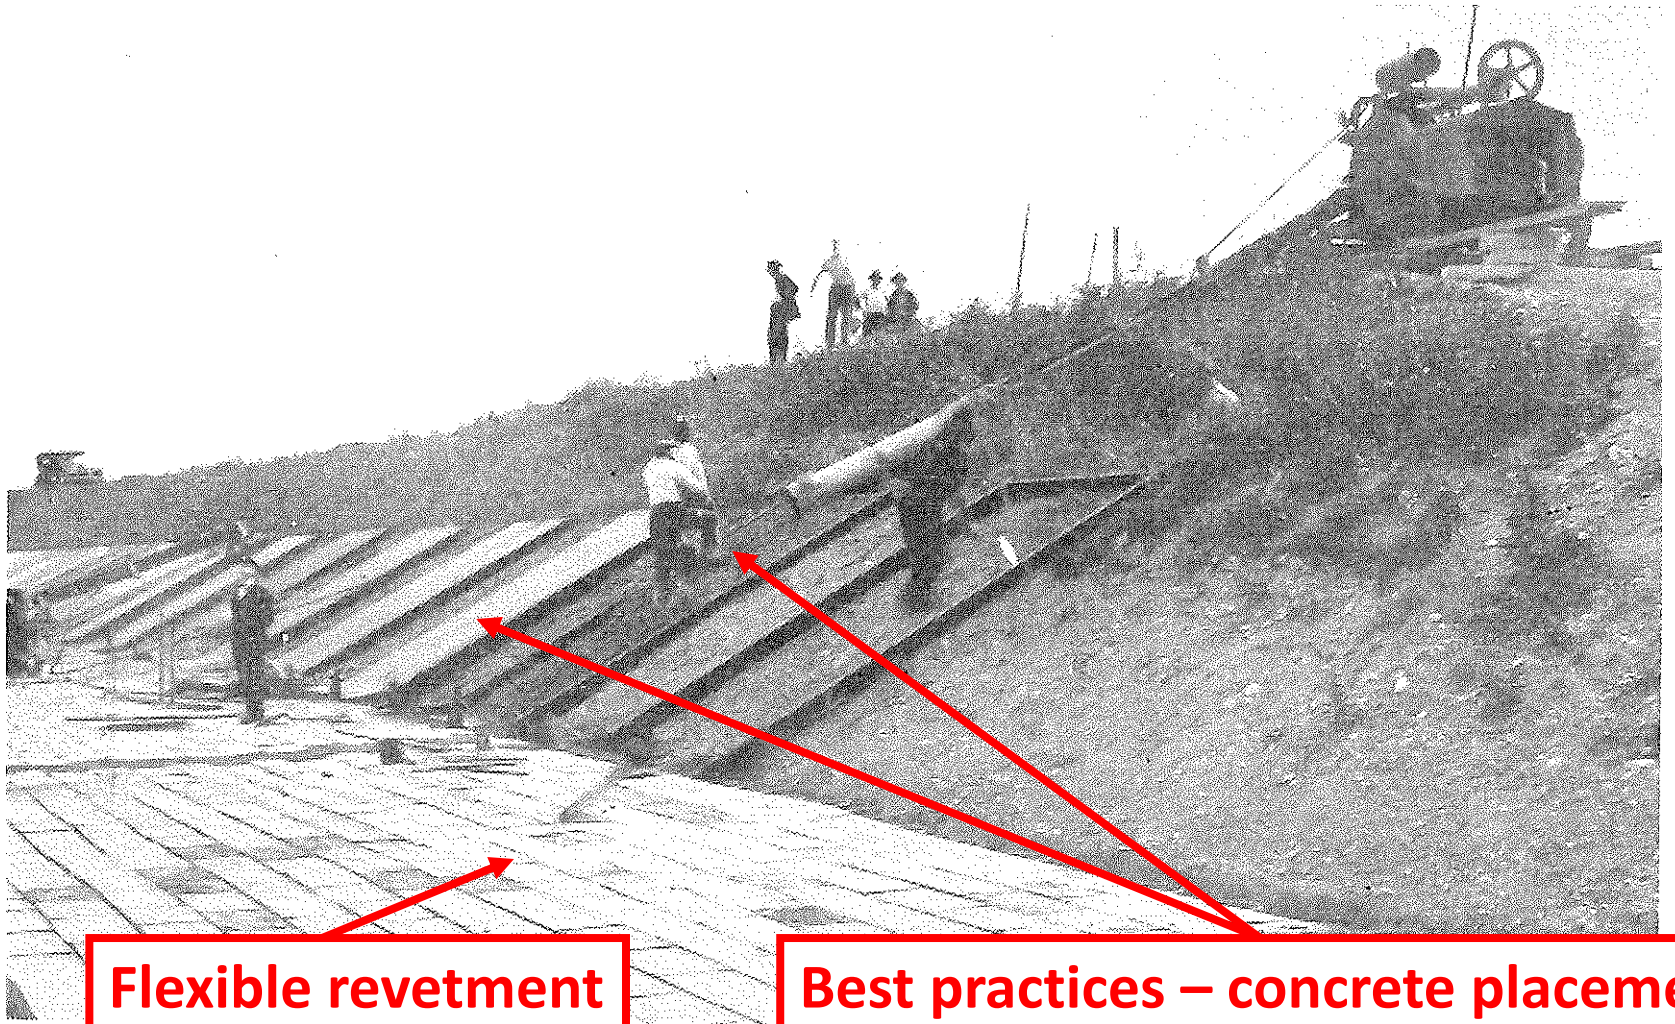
Dayton Feature - Laying blocks for flexible revetment. Looking upstream of Great Miami River. McKinley Park sewer outlet in slope
